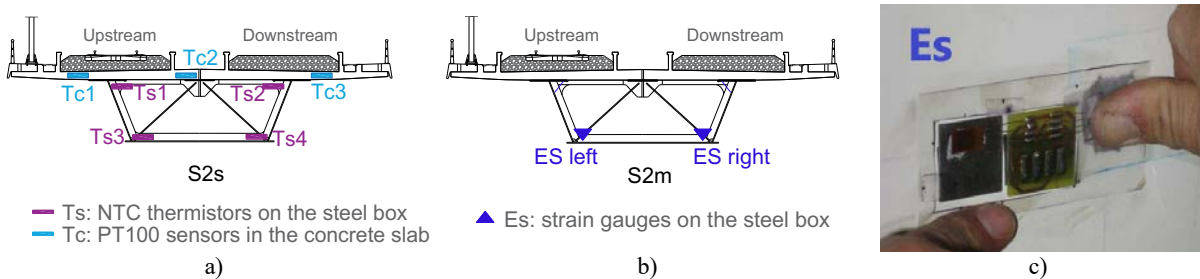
Bridge cross section: NTC thermistors in the steel box (Ts) and PT100 sensors in the concrete slab (Tc), b) strain gauges in the steel box (Es), c) electric strain gauge (Es) installation.
